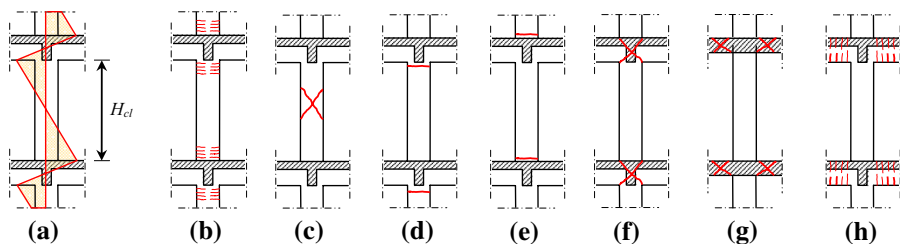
a Static system assumed: moment distribution of an R.C. column caused by earthquake loading and b–h possible modes of failure: b flexural yielding; c shear failure; d anchorage failure of longitudinal reinforcement; e failure of lap splices; f beam-column joint shear failure; g punching failure in slab-column connections; h yielding of the longitudinal reinforcement of the adjacent beams (Pardalopoulos et al. 2018a)
